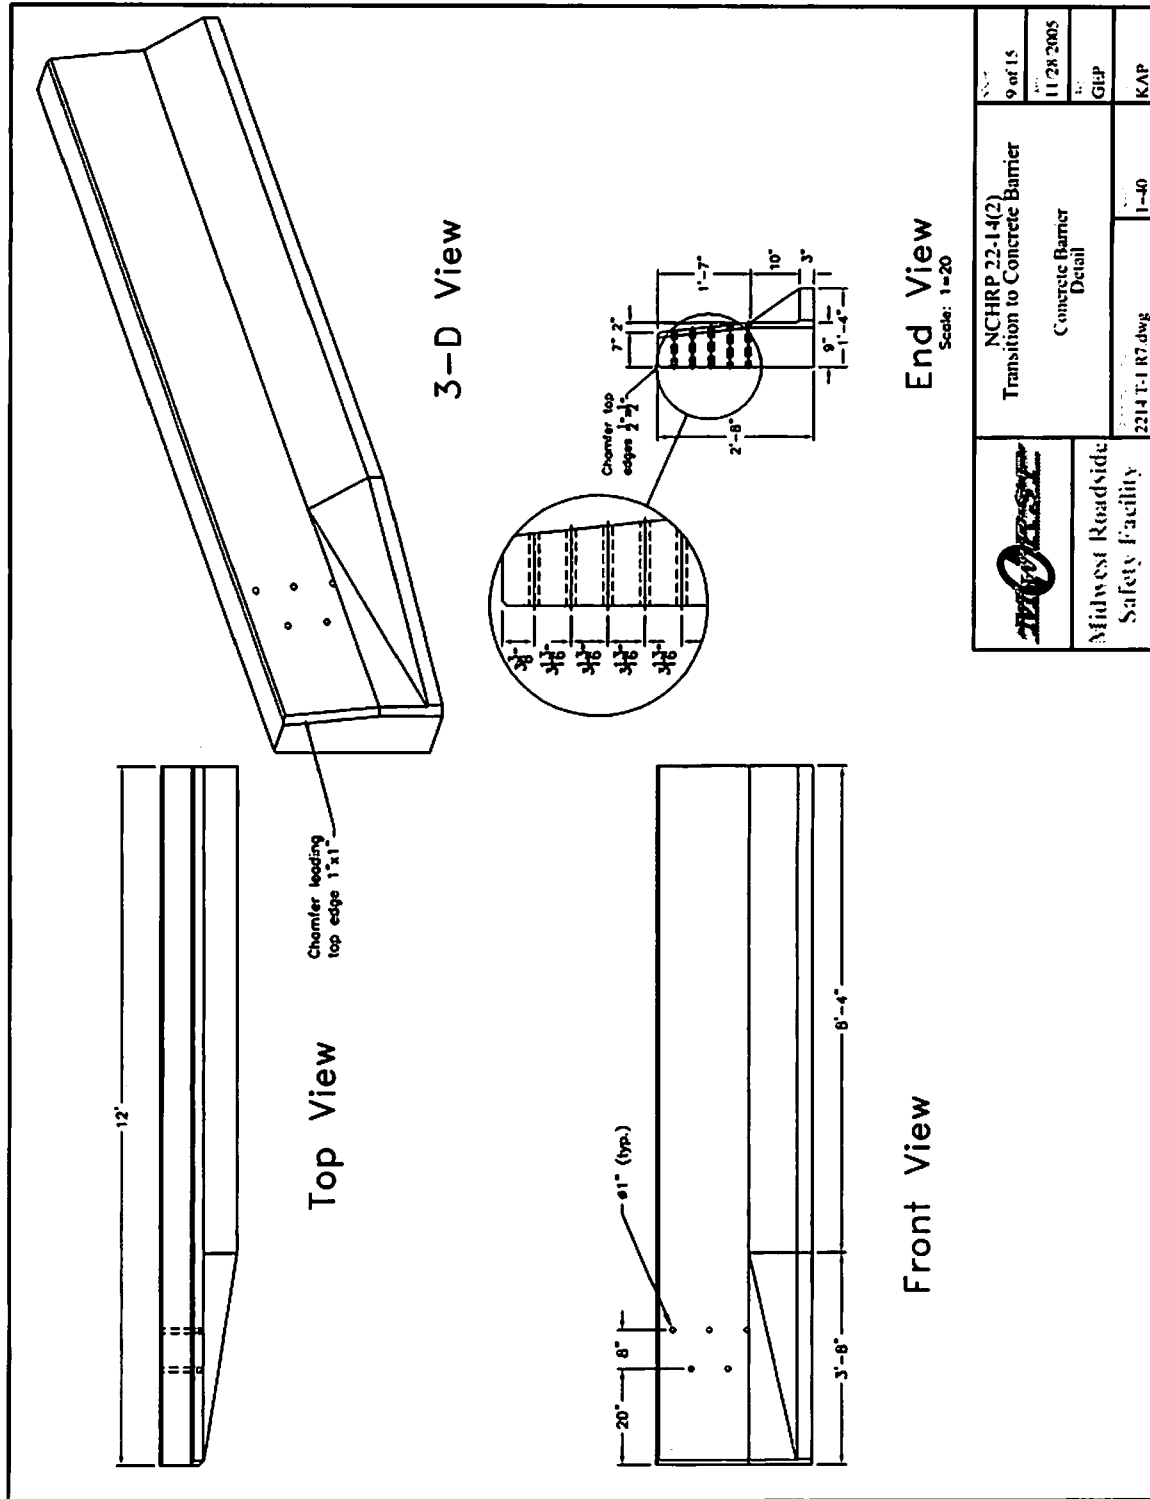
Approach Guardrail Transition to Concrete Barrier Design - Concrete Barrier Details (English)
